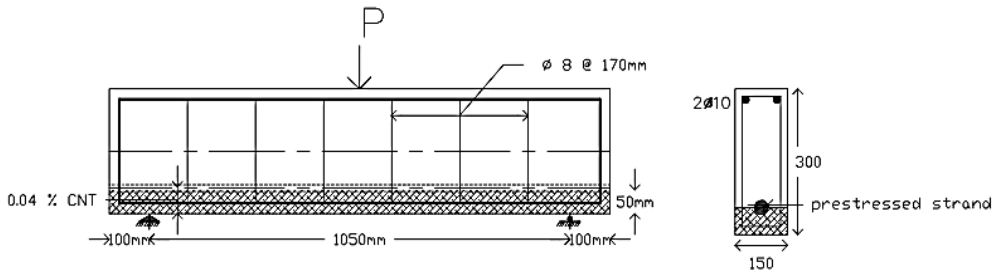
Reinforcement details of fully post-tensioned concrete beams with CNT
